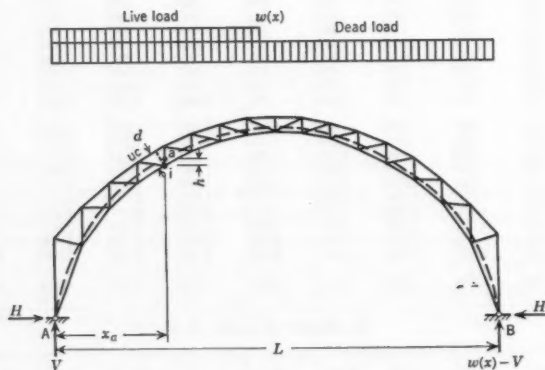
THE TWO-HINGED TRUSS ARCH
